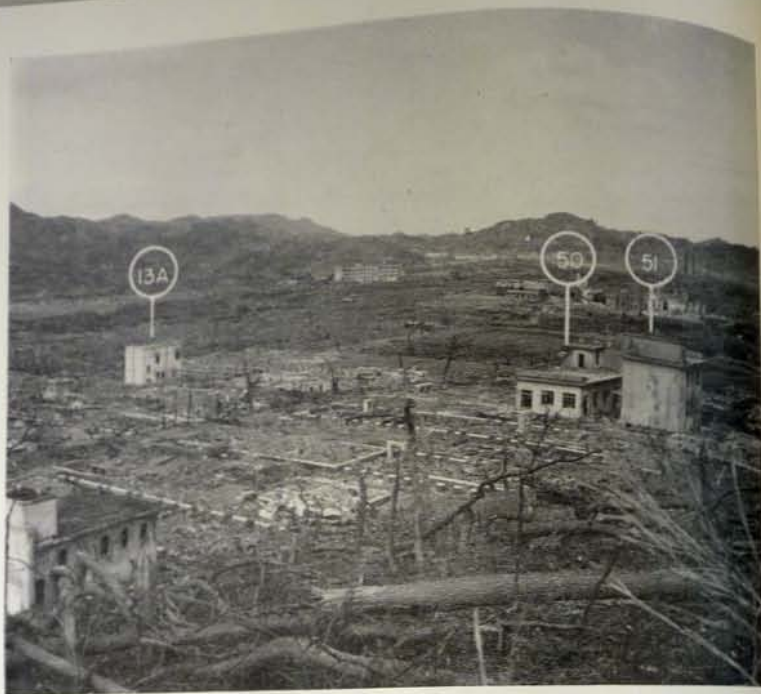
1,500 feet from GZ. Group 17, general view looking northwest over debris of burned buildings.
